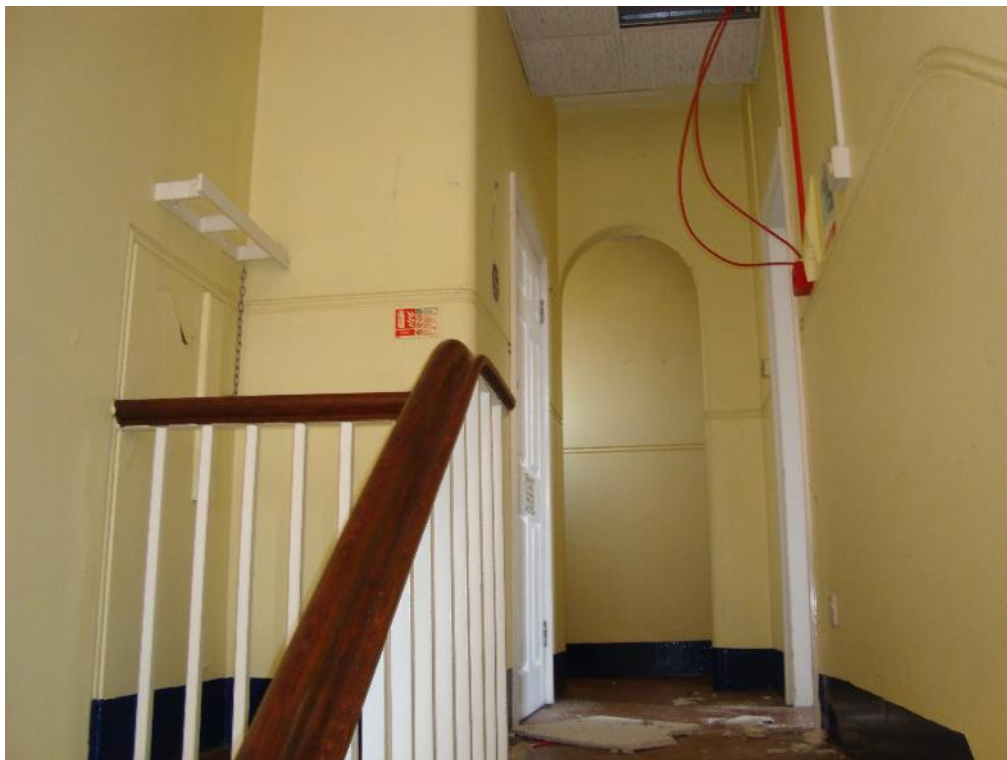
Station, Range 1, second floor level stairwell, facing north-west (CgMs_0151)
